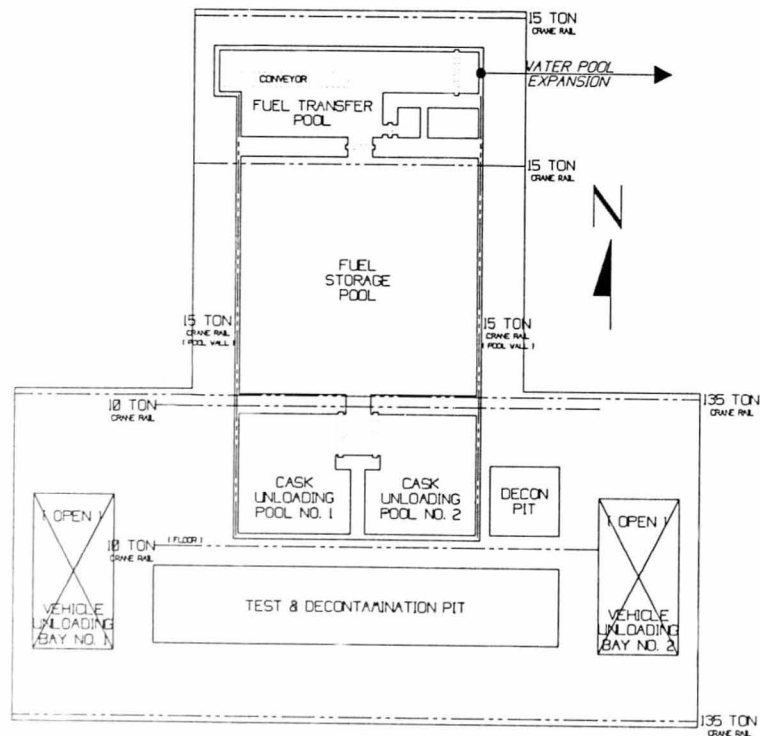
Plan view of the Barnwell Plant Fuel Receiving and Storage Station.
